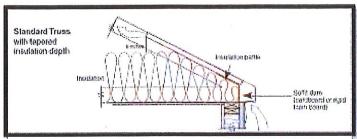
Standard truss with attic space. Source: Attic Eave Minimum Insulation | Building America Solution Center (onnl.gov)
